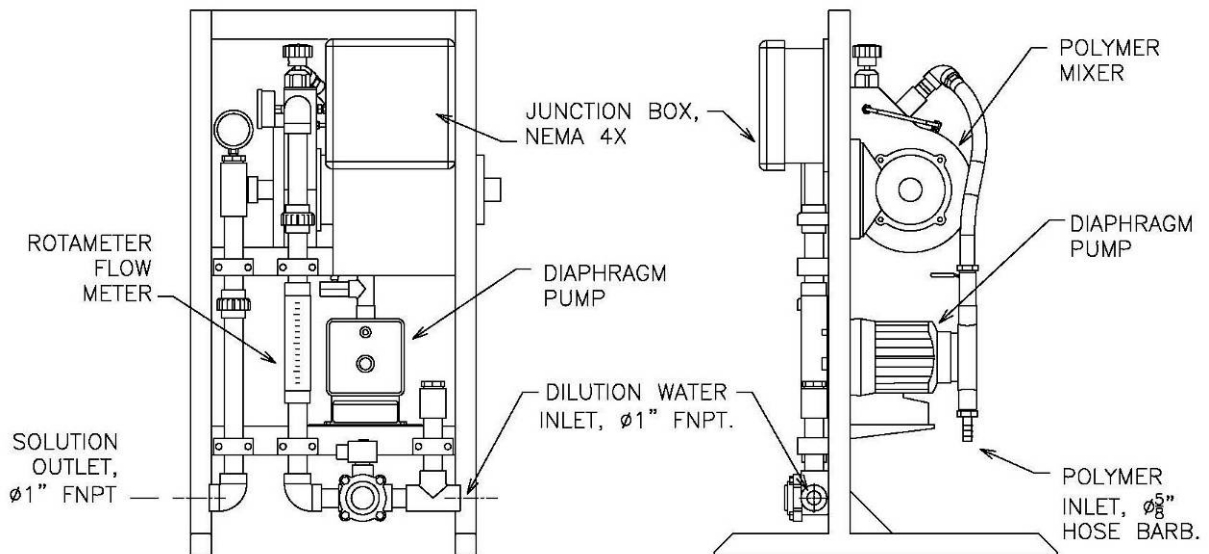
Flocculation tank end elevation view component drawing
